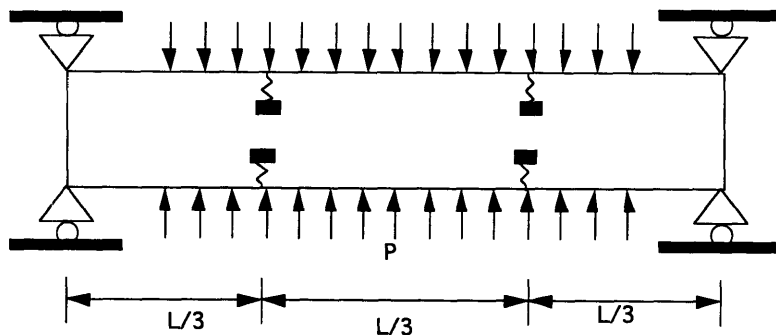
Cylinder with Stiffeners at 1/3 Points Under Hydrostatic Load (P)
